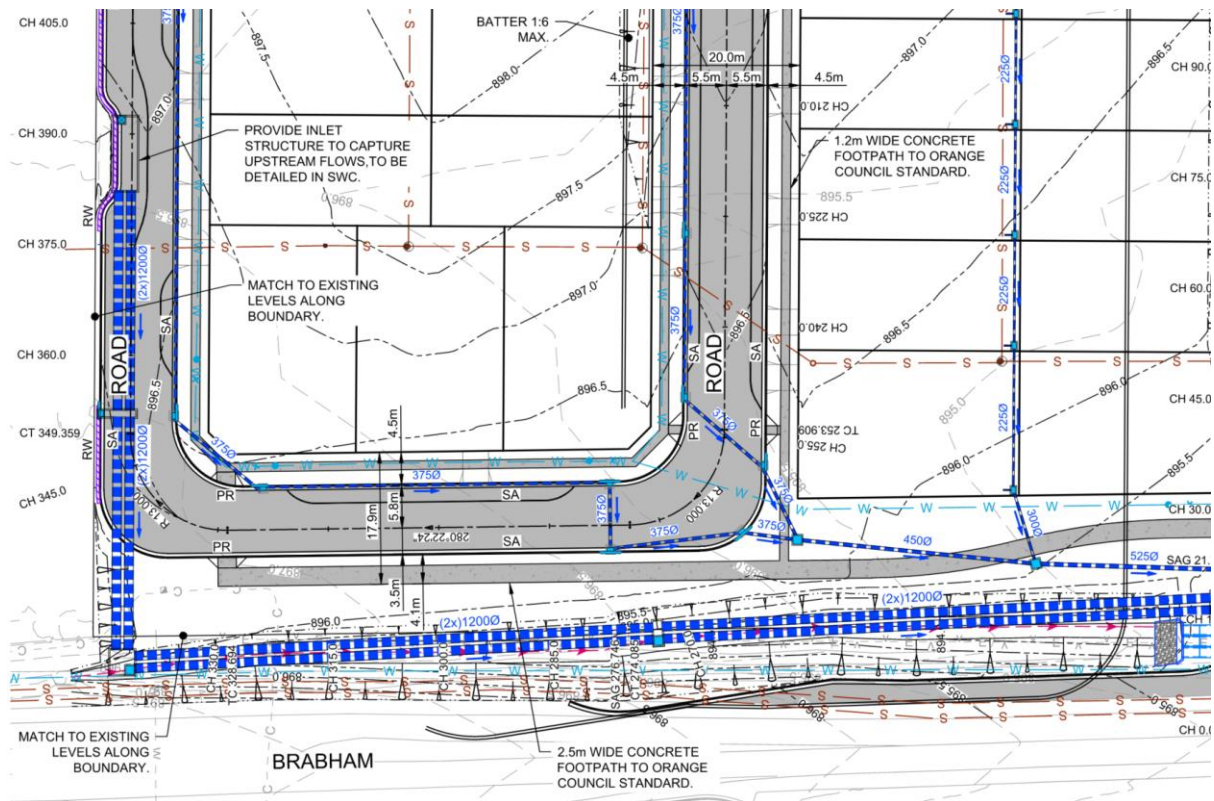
Updated DA Road and Drainage Plan along Road No.04
